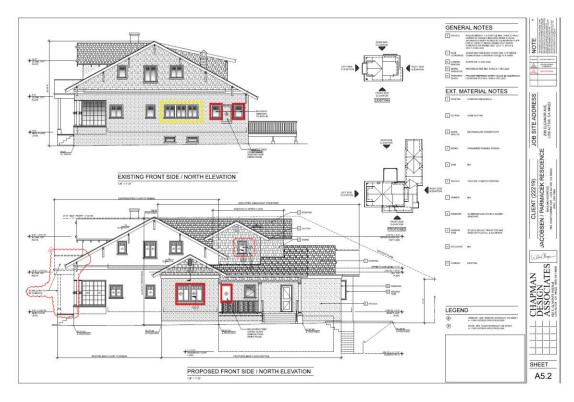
Sheet A5.2 shows the original windows that will be relocated and their proposed locations (Chapman Design Associates, 10/17/2024).
